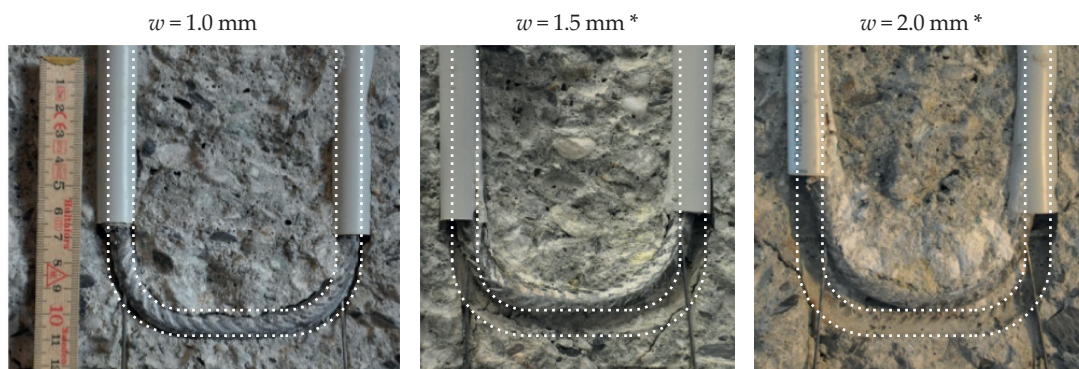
Saw-cuts performed after test in specimen *SB10* with deformed U-shaped bars disposed parallel to cracks (dashed line for initial position and geometry of the detail)
